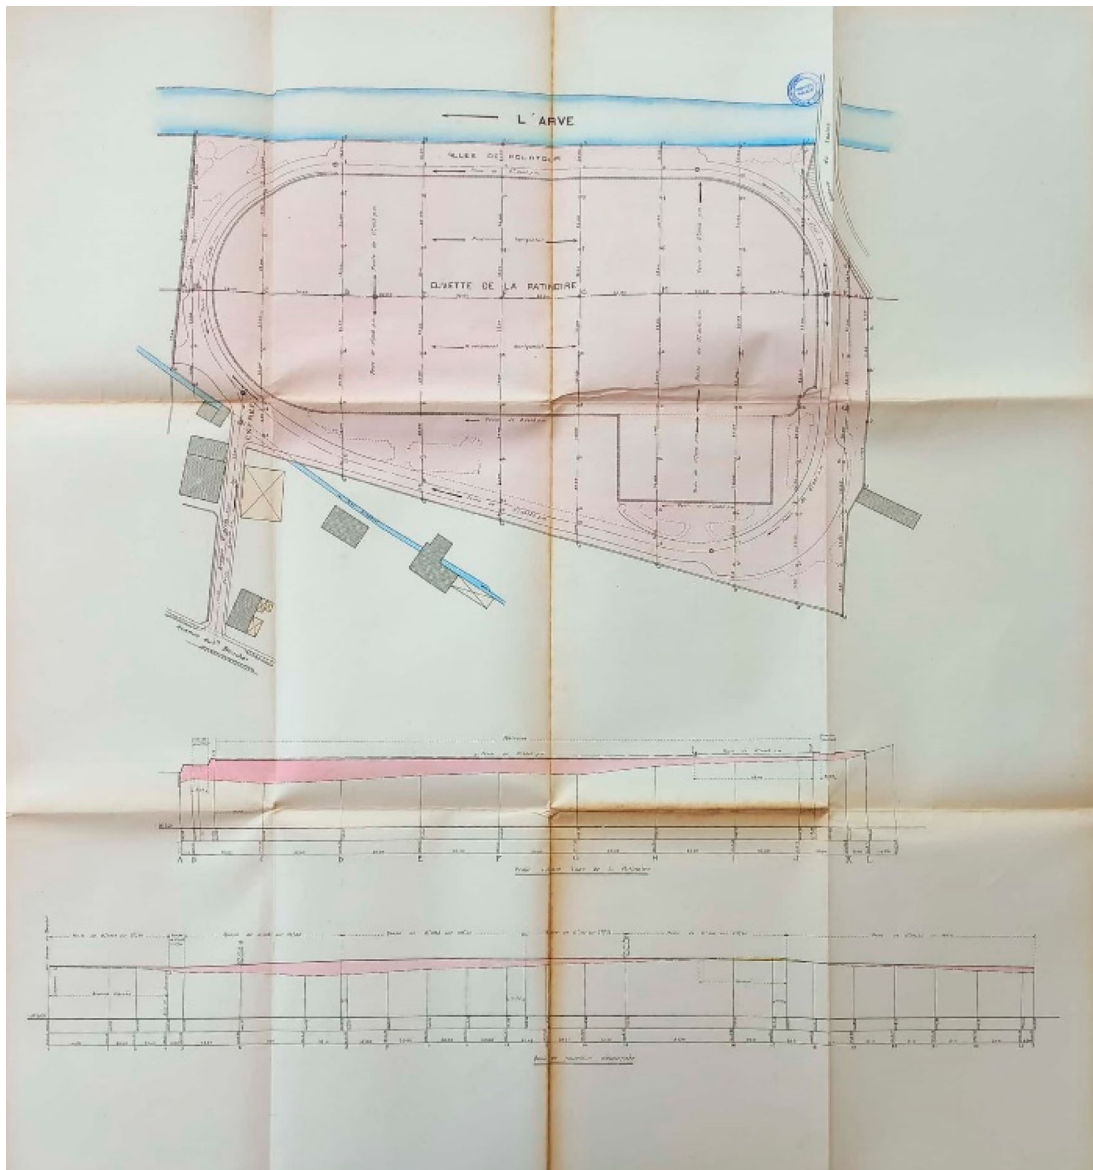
Project for the new ice rink. Levelling plan, 06/04/1923, 2 O 2181, Arch. dép. Haute-Savoie.
